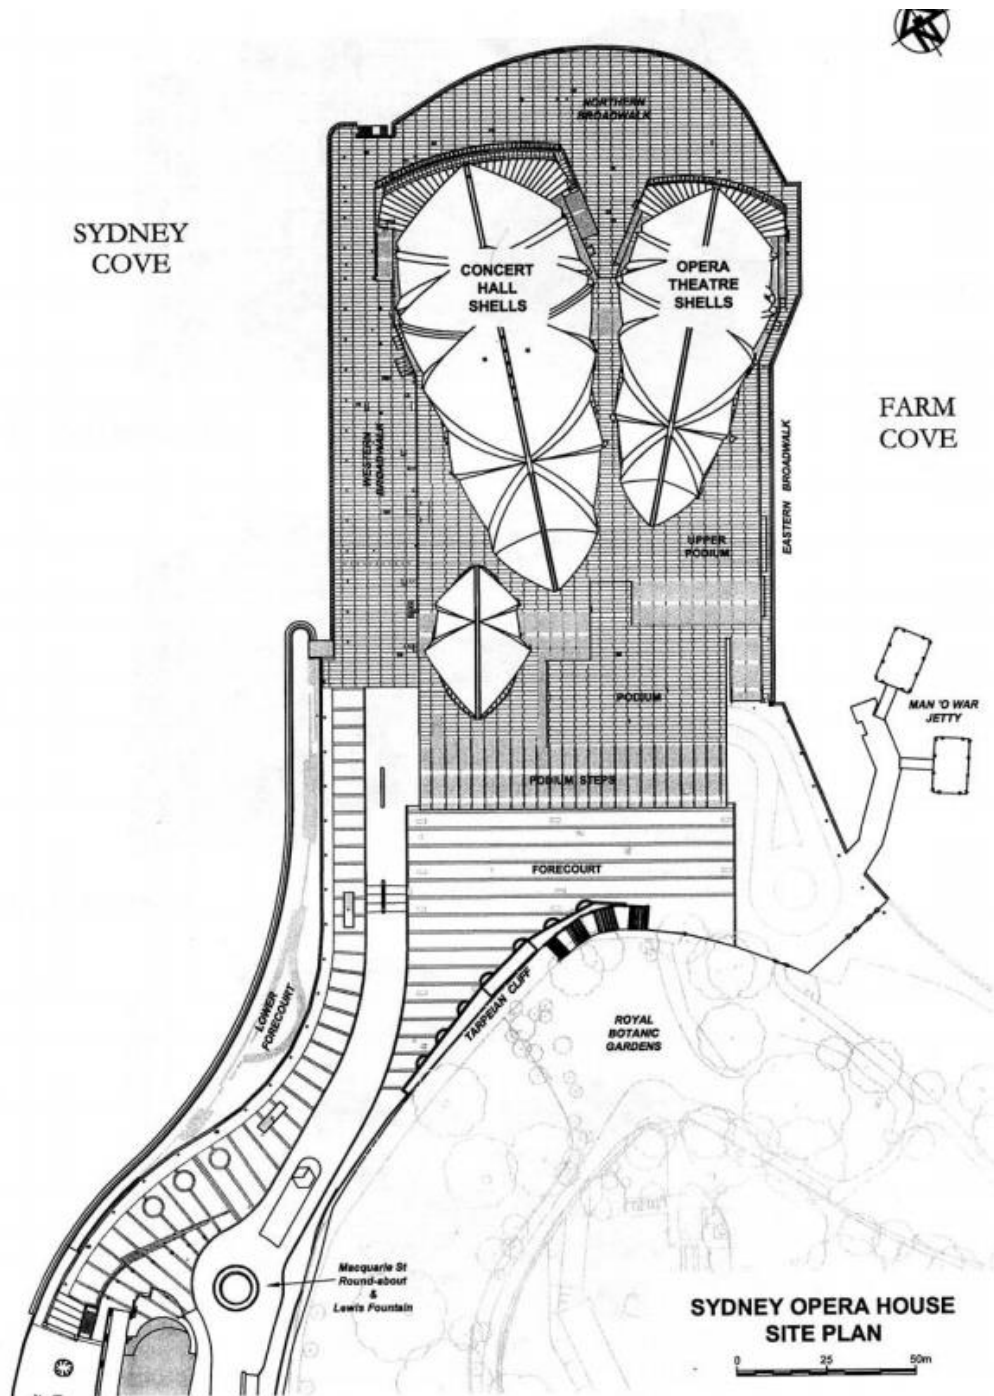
Sydney Opera House Site Plan (Source: SOH Conservation Management Plan)
